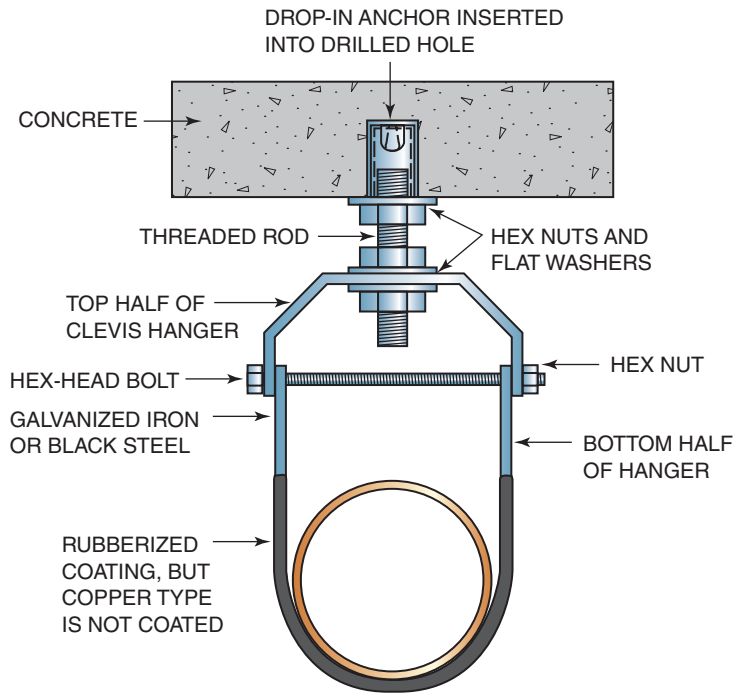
Using a concrete drop-in anchor is a common attachment method; a clevis hanger is a common type for installing horizontal piping.
